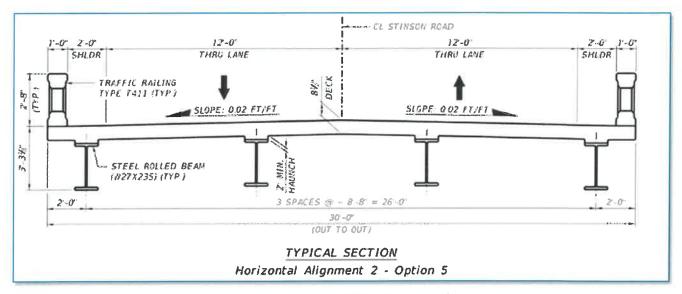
Steel Rolled Beams (W27X235) Typical Section
